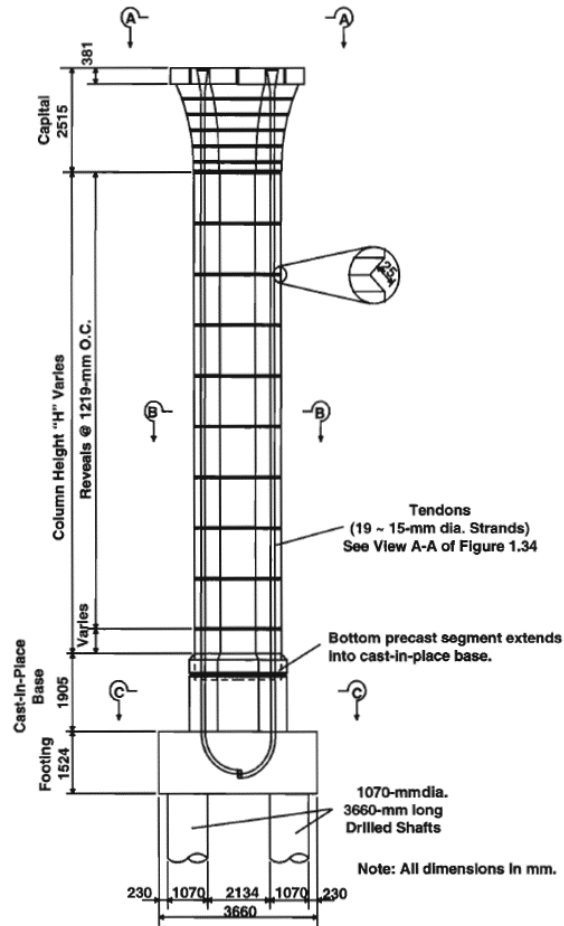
Typical Large ramp pier in US 183 bridge: elevation view (Davis et al. 1998)
